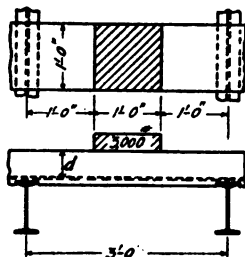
LOAD ON ONE-FT. STRIP OF FLOOR SLAB
